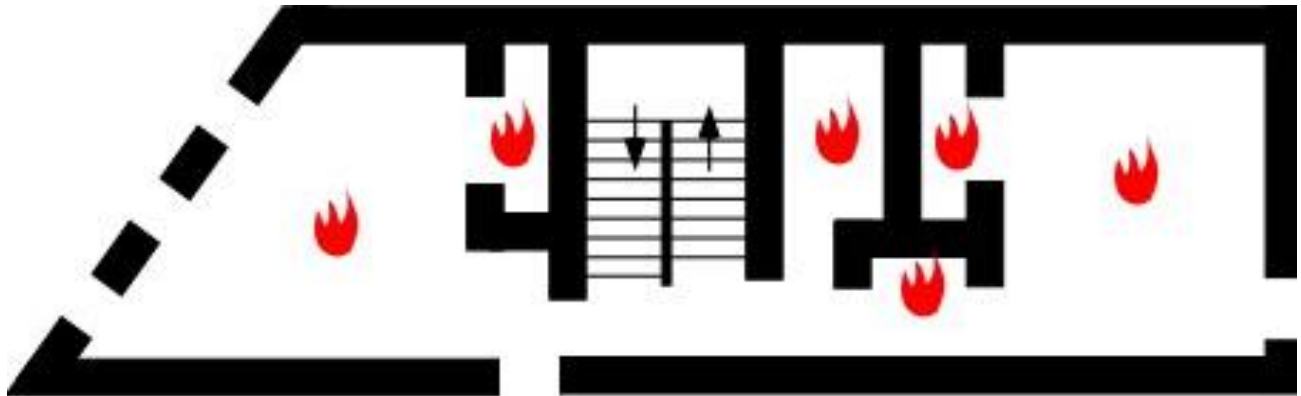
Typical floor plan of a smoke building (Source: Mion, 2008).
